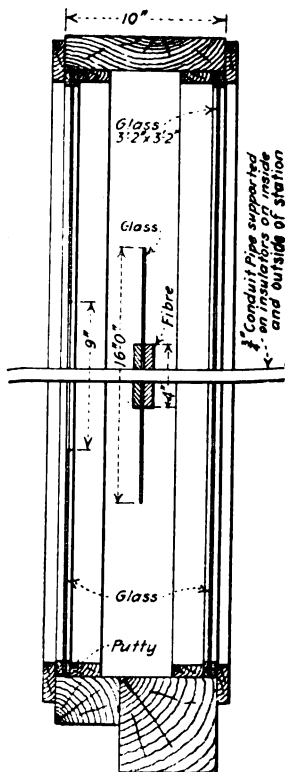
WASHINGTON WATER POWER CO. DETAIL OF WALL ENTRANCE FOR HIGH-TENSION LINE, ODESSA SUBSTATION
